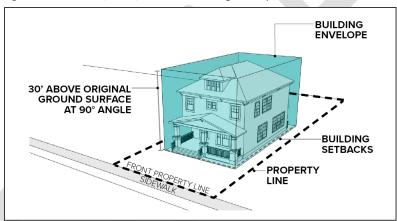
XX.4 R-1-6 Building Envelope (alternative – apply to R-3,4 and 5)
